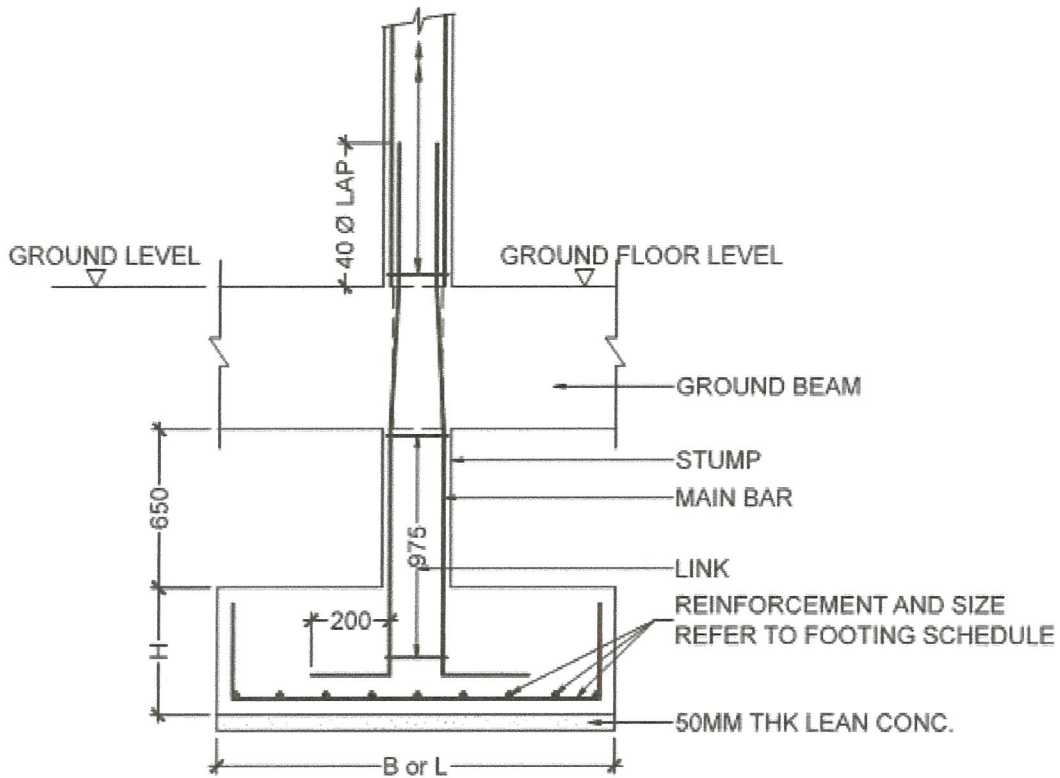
(a) CROSS SECTION FOR PAD FOOTING
